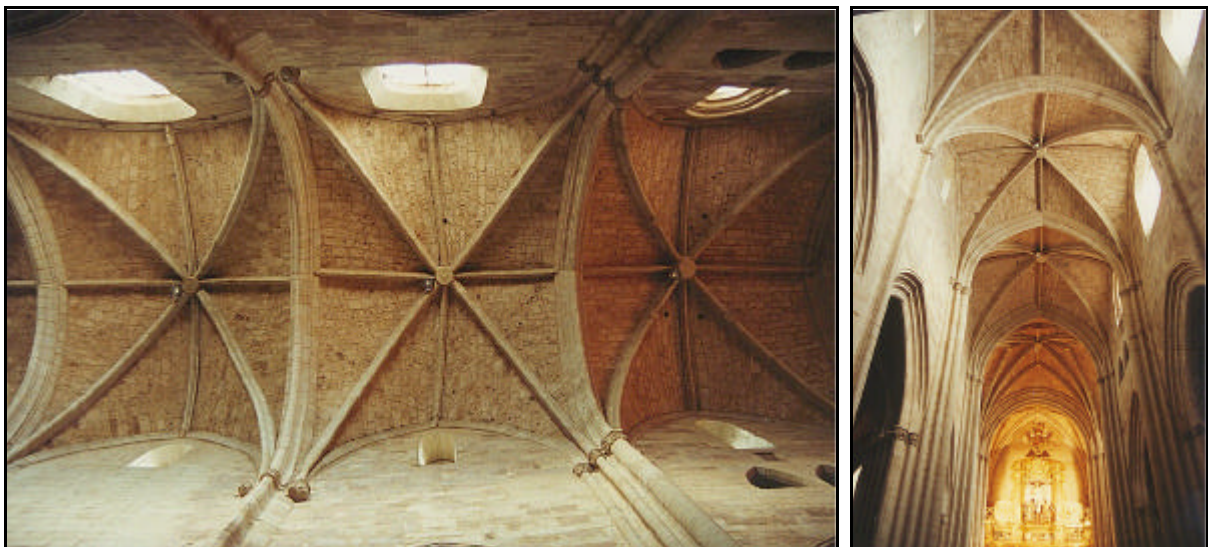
Main nave of the Church of Santa Maria la Real, in Najera, Spain. A geometric analysis of the church shows the vaulting system completely distorted. Arches and vaults are deformed, the walls and columns are bended and cracks appear on the aisles. Geometry is the first test to verify the structural state of a gothic construction.
